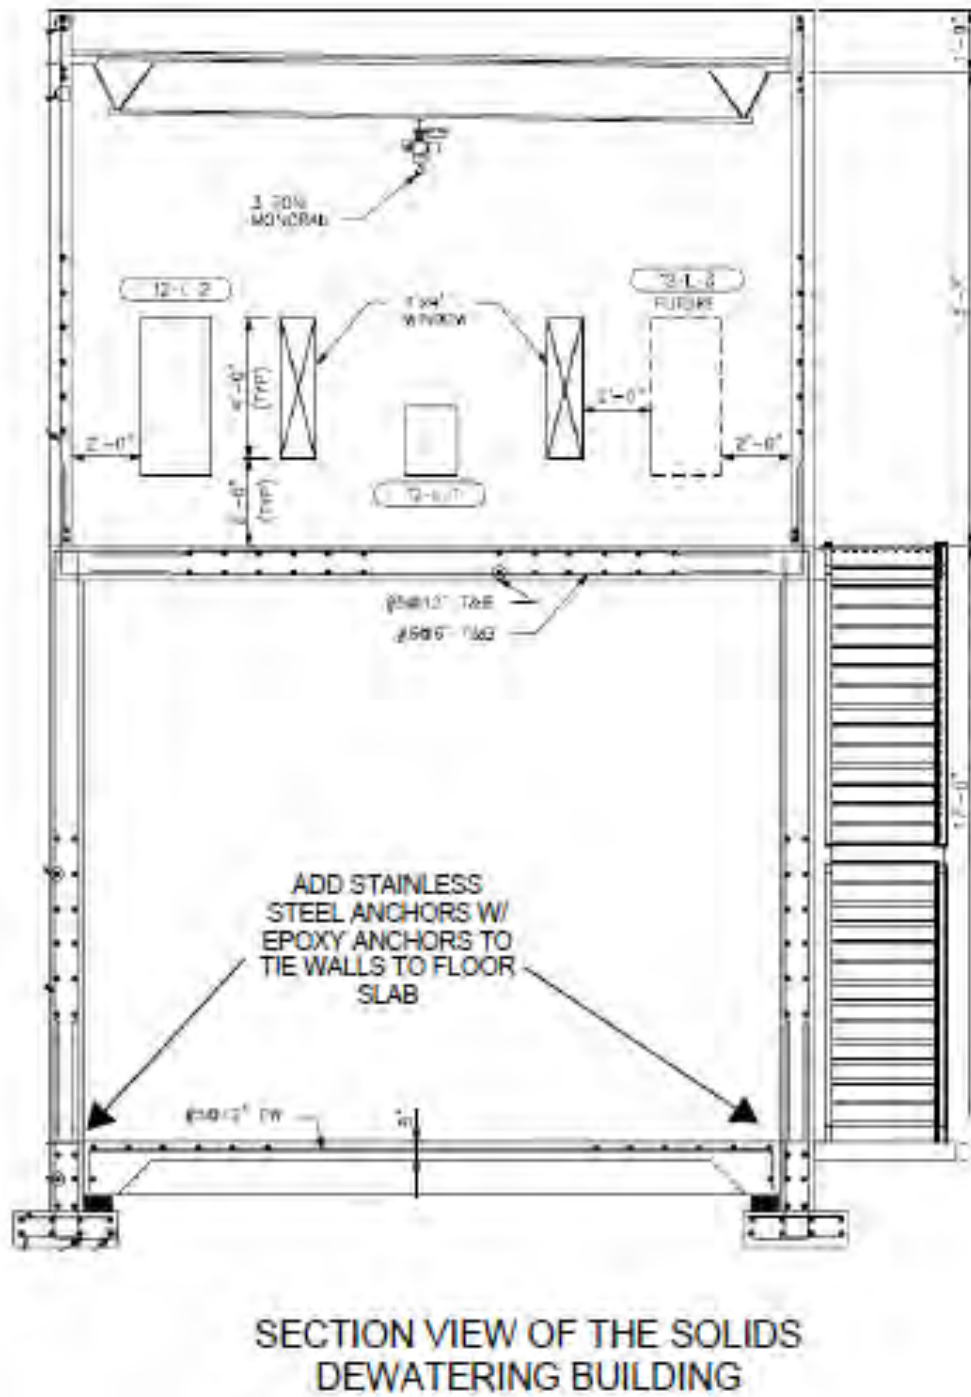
Conceptual Retrofit to Tie the Floor Slab Together with the East and West Wall Footings at the Solids Dewatering Building
